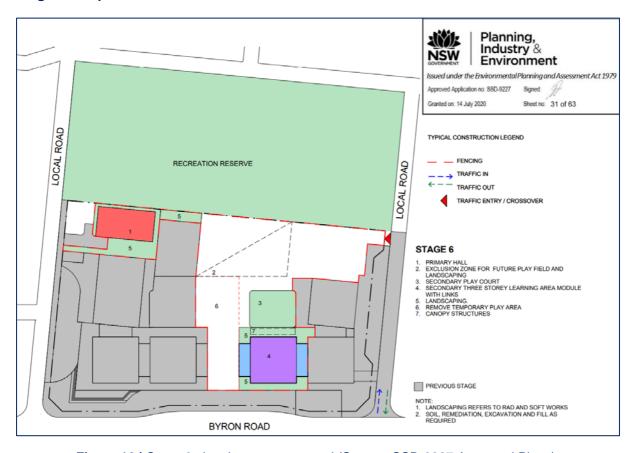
| Stage 6 site plan – as approved (Source: SSD-9227 Approved Plans)
